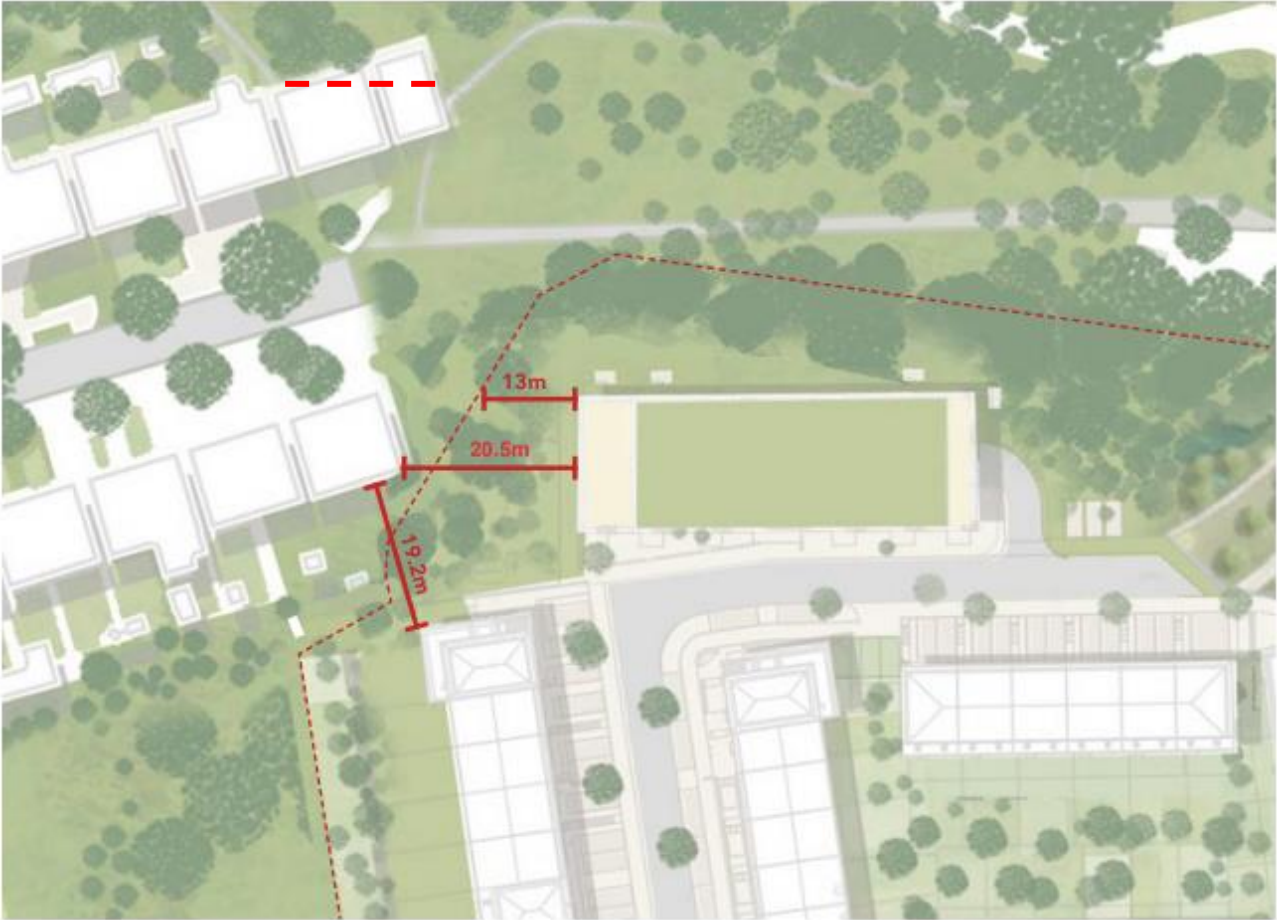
Site Layout showing distance Building 1D from Existing Development
